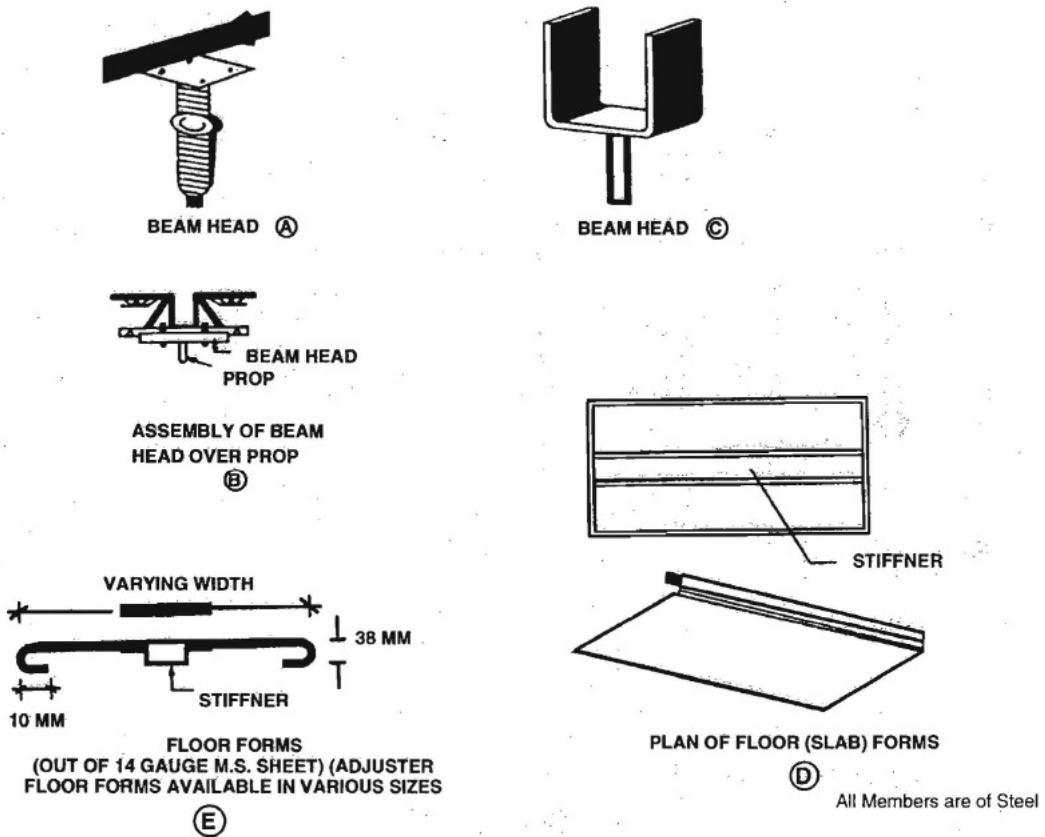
Typical Detail of Beam Head and Stiffner (Clause 5.2.3.3)
